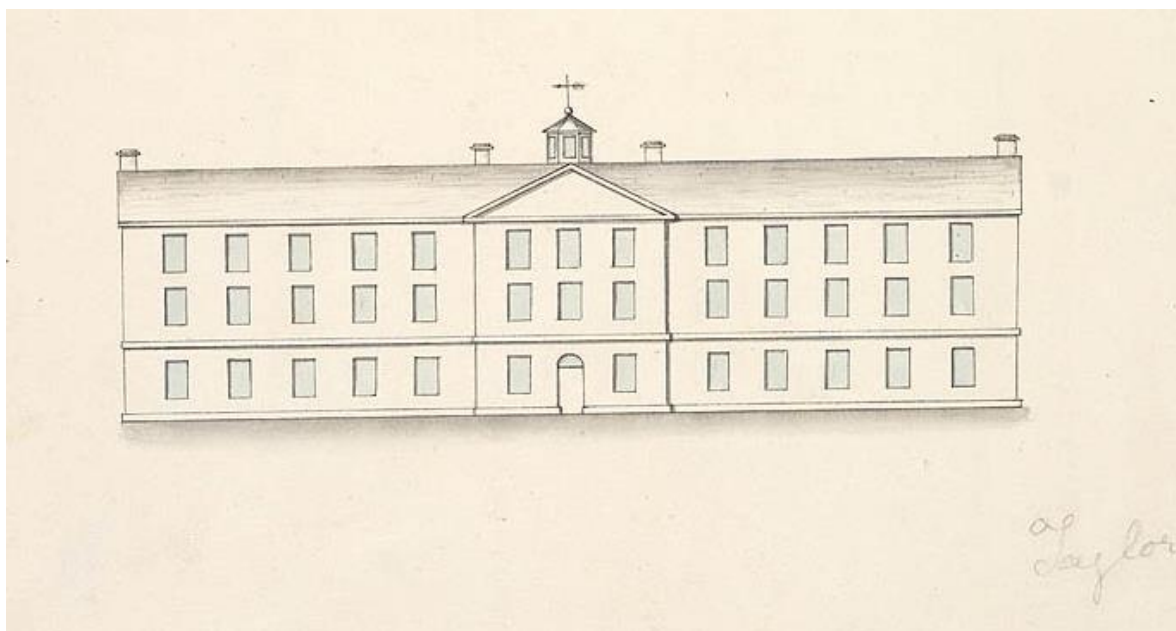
1823 elevation of the Parramatta Female Factory, SL Harris, C 226, ML SLNSW.
